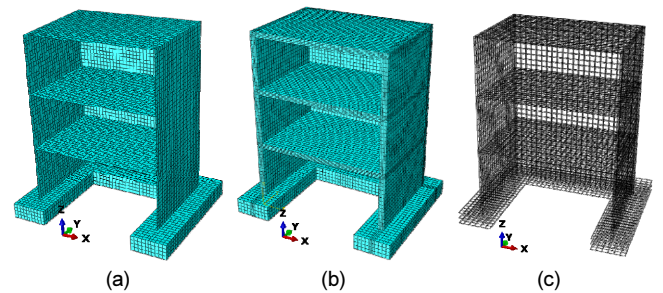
Finite element modeling for shear walls: (a) shell, (b) solid, and (c) reinforcing bar arrangement
